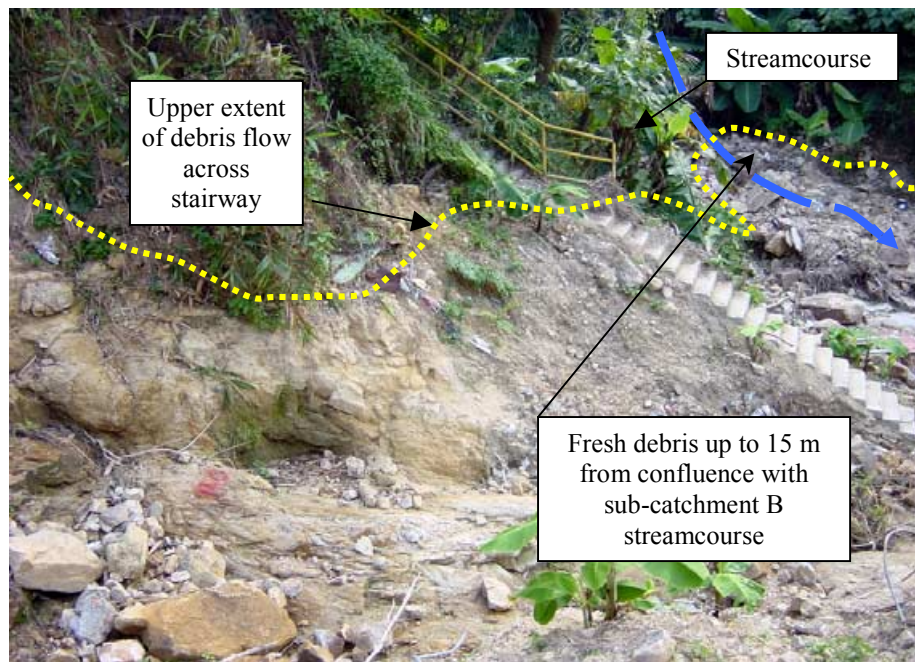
View of Concrete Stairway near Sharp Bend in Debris Trail at Chainage 185
